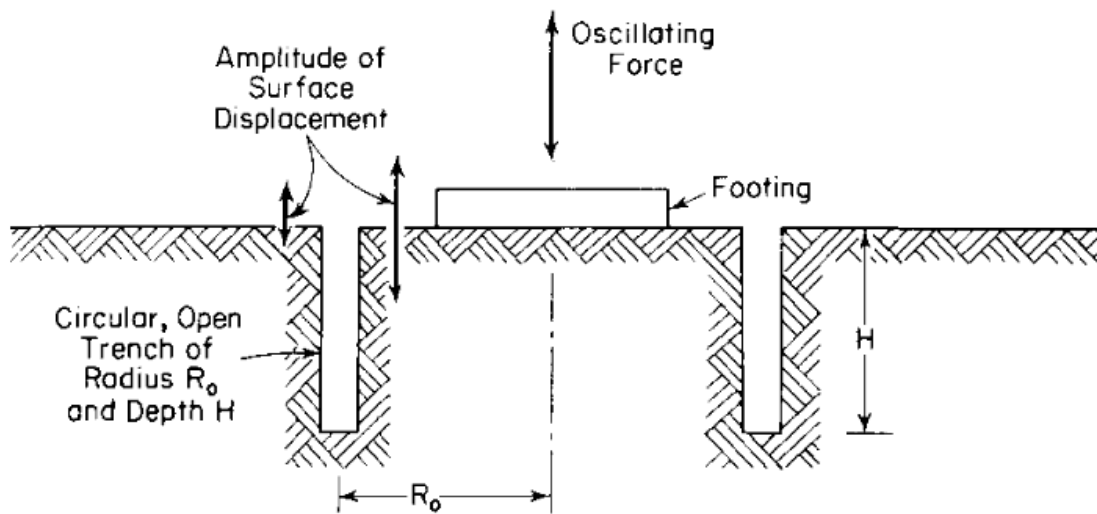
a: Active isolation vibration: circular open trench surrounding vibration footing after (woods 1968).
